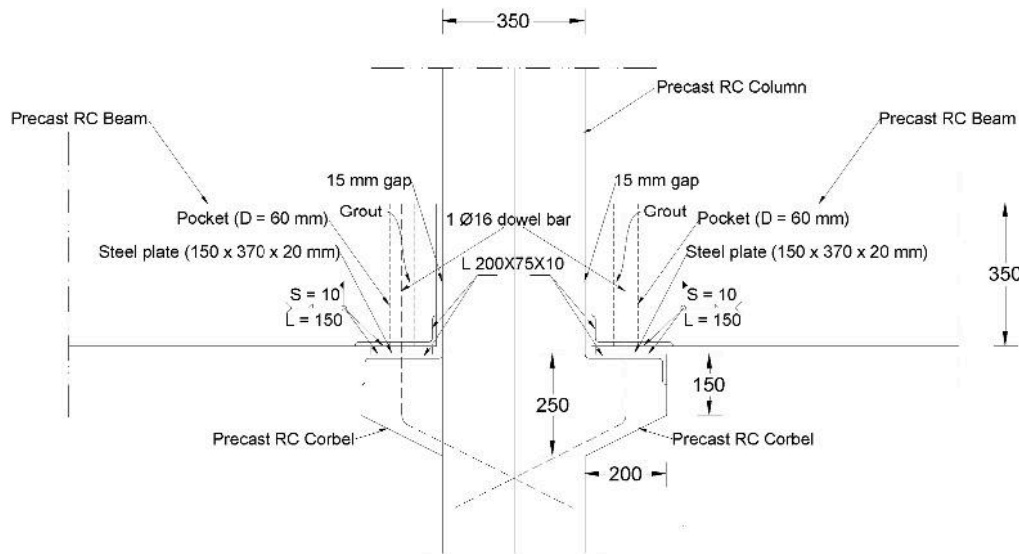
Details of middle connection for precast assembly P-SC-T1-ANG (Dimensions are measured in mm).
